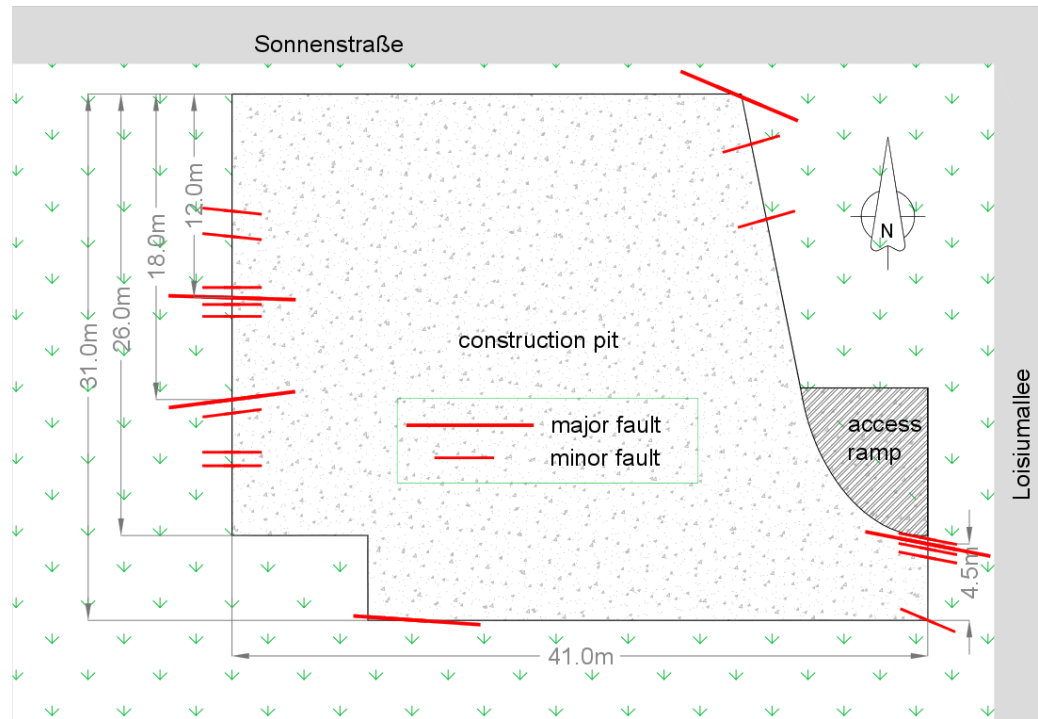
Plan view of building pit with faults plus approximate strike.
